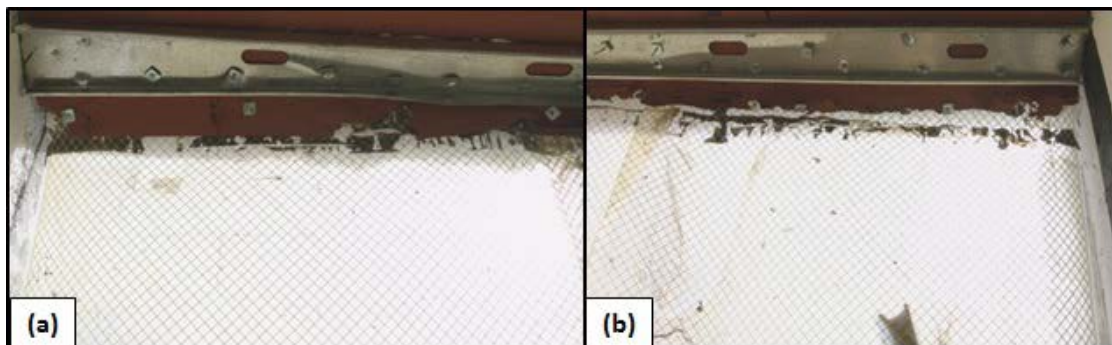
FS17. (a) Deformed anchor support on left side. (b) Right anchor support.
